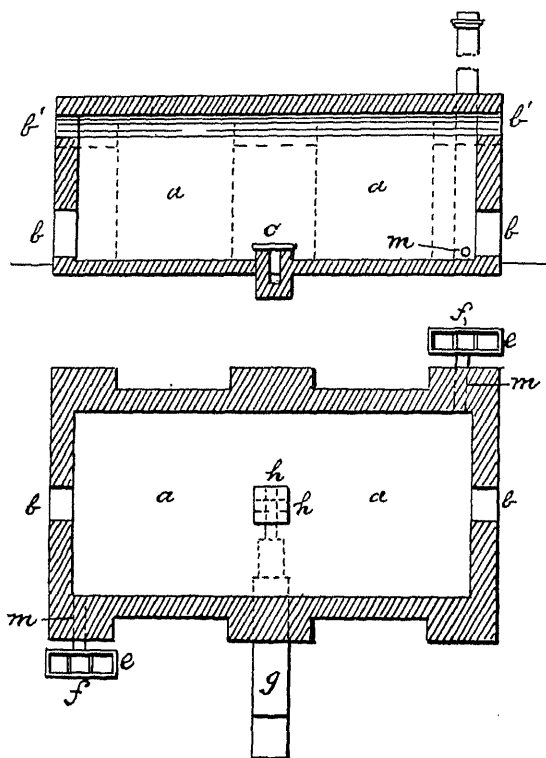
Longitudinal Section and Plan of Charcoal Oven.
